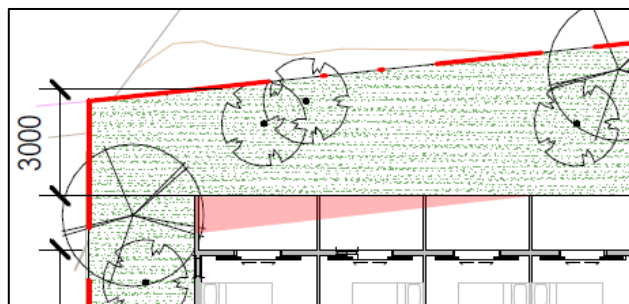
Extent of encroachment of building into rear setback at ground floor (red shading).
